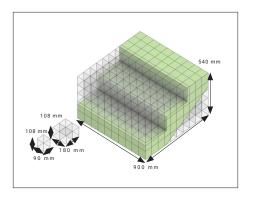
, Wall stacked, wall with opening & wall with storage & the predefined blocks for the walls (providing different slopes for arches)
